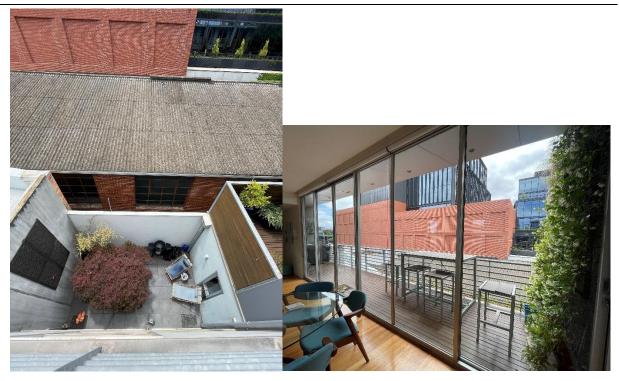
(left): the ground floor courtyard and first floor terrace of 1/7 Sanders Place (the most western townhouse), abutted by the existing single storey building of the subject site, and the office building at No. 459 – 471 Church Street beyond (Officer site visit, November 2023)
